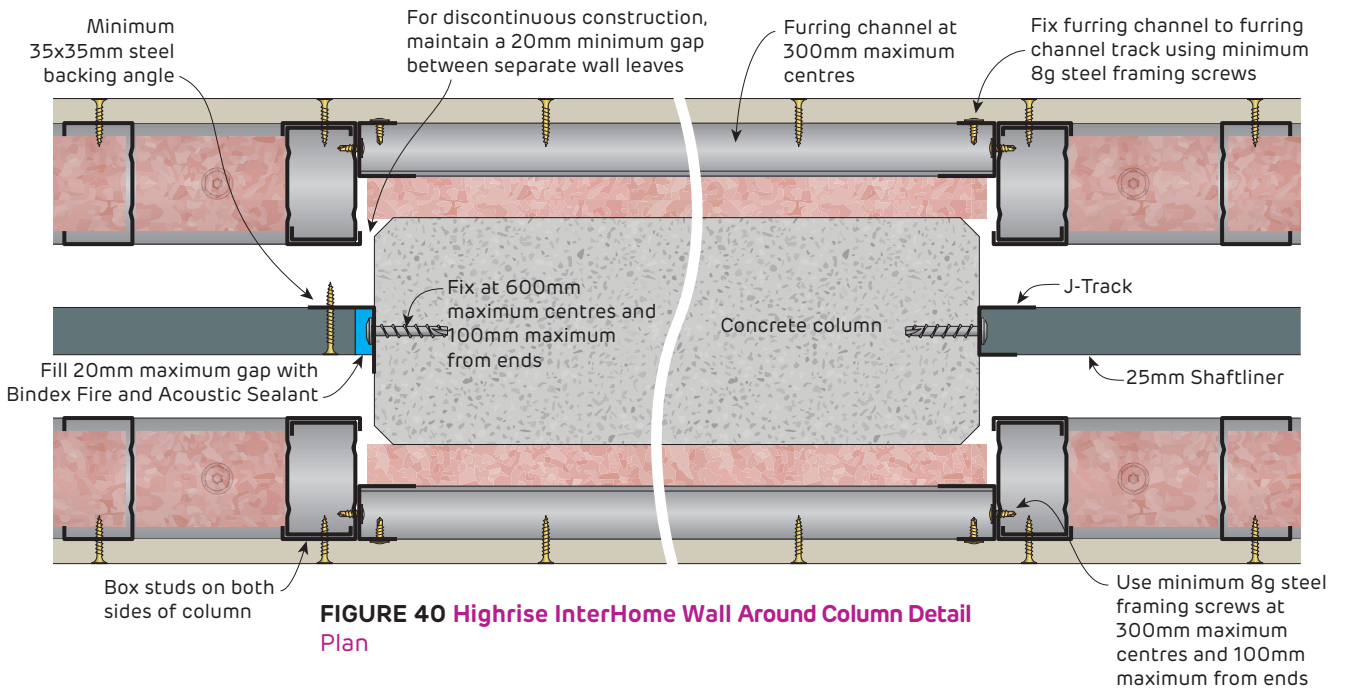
Highrise InterHome Wall Around Column Detail Plan
